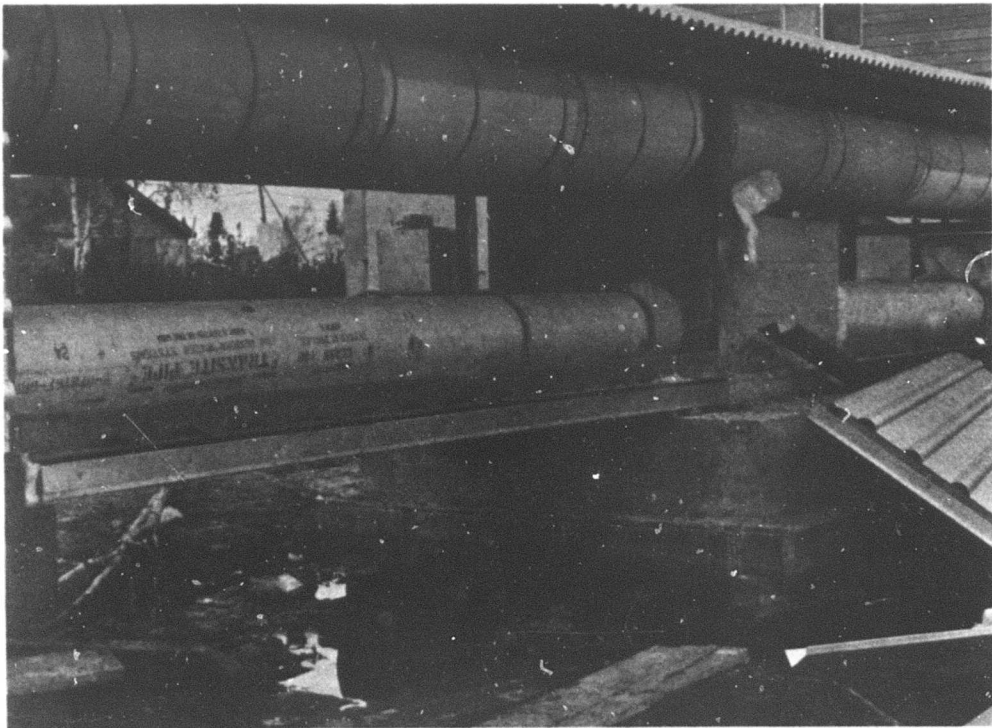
Anchor point on straight section of utilidor. Concrete block on three wood pilings.
